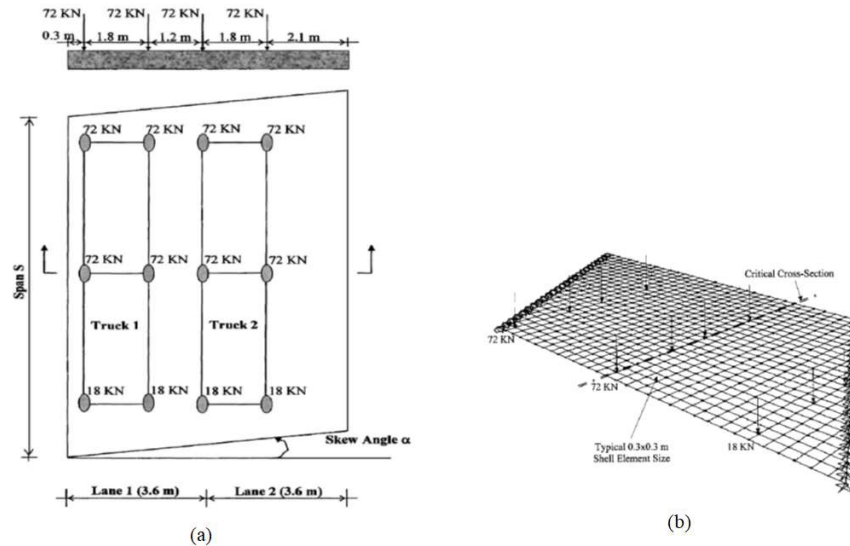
a) Typical two-lane skewed bridge with edge loading b) Typical finite element model for a 10.8 m span, two-lane bridge, with 30° skewness (Menassa et. al, 2007)
